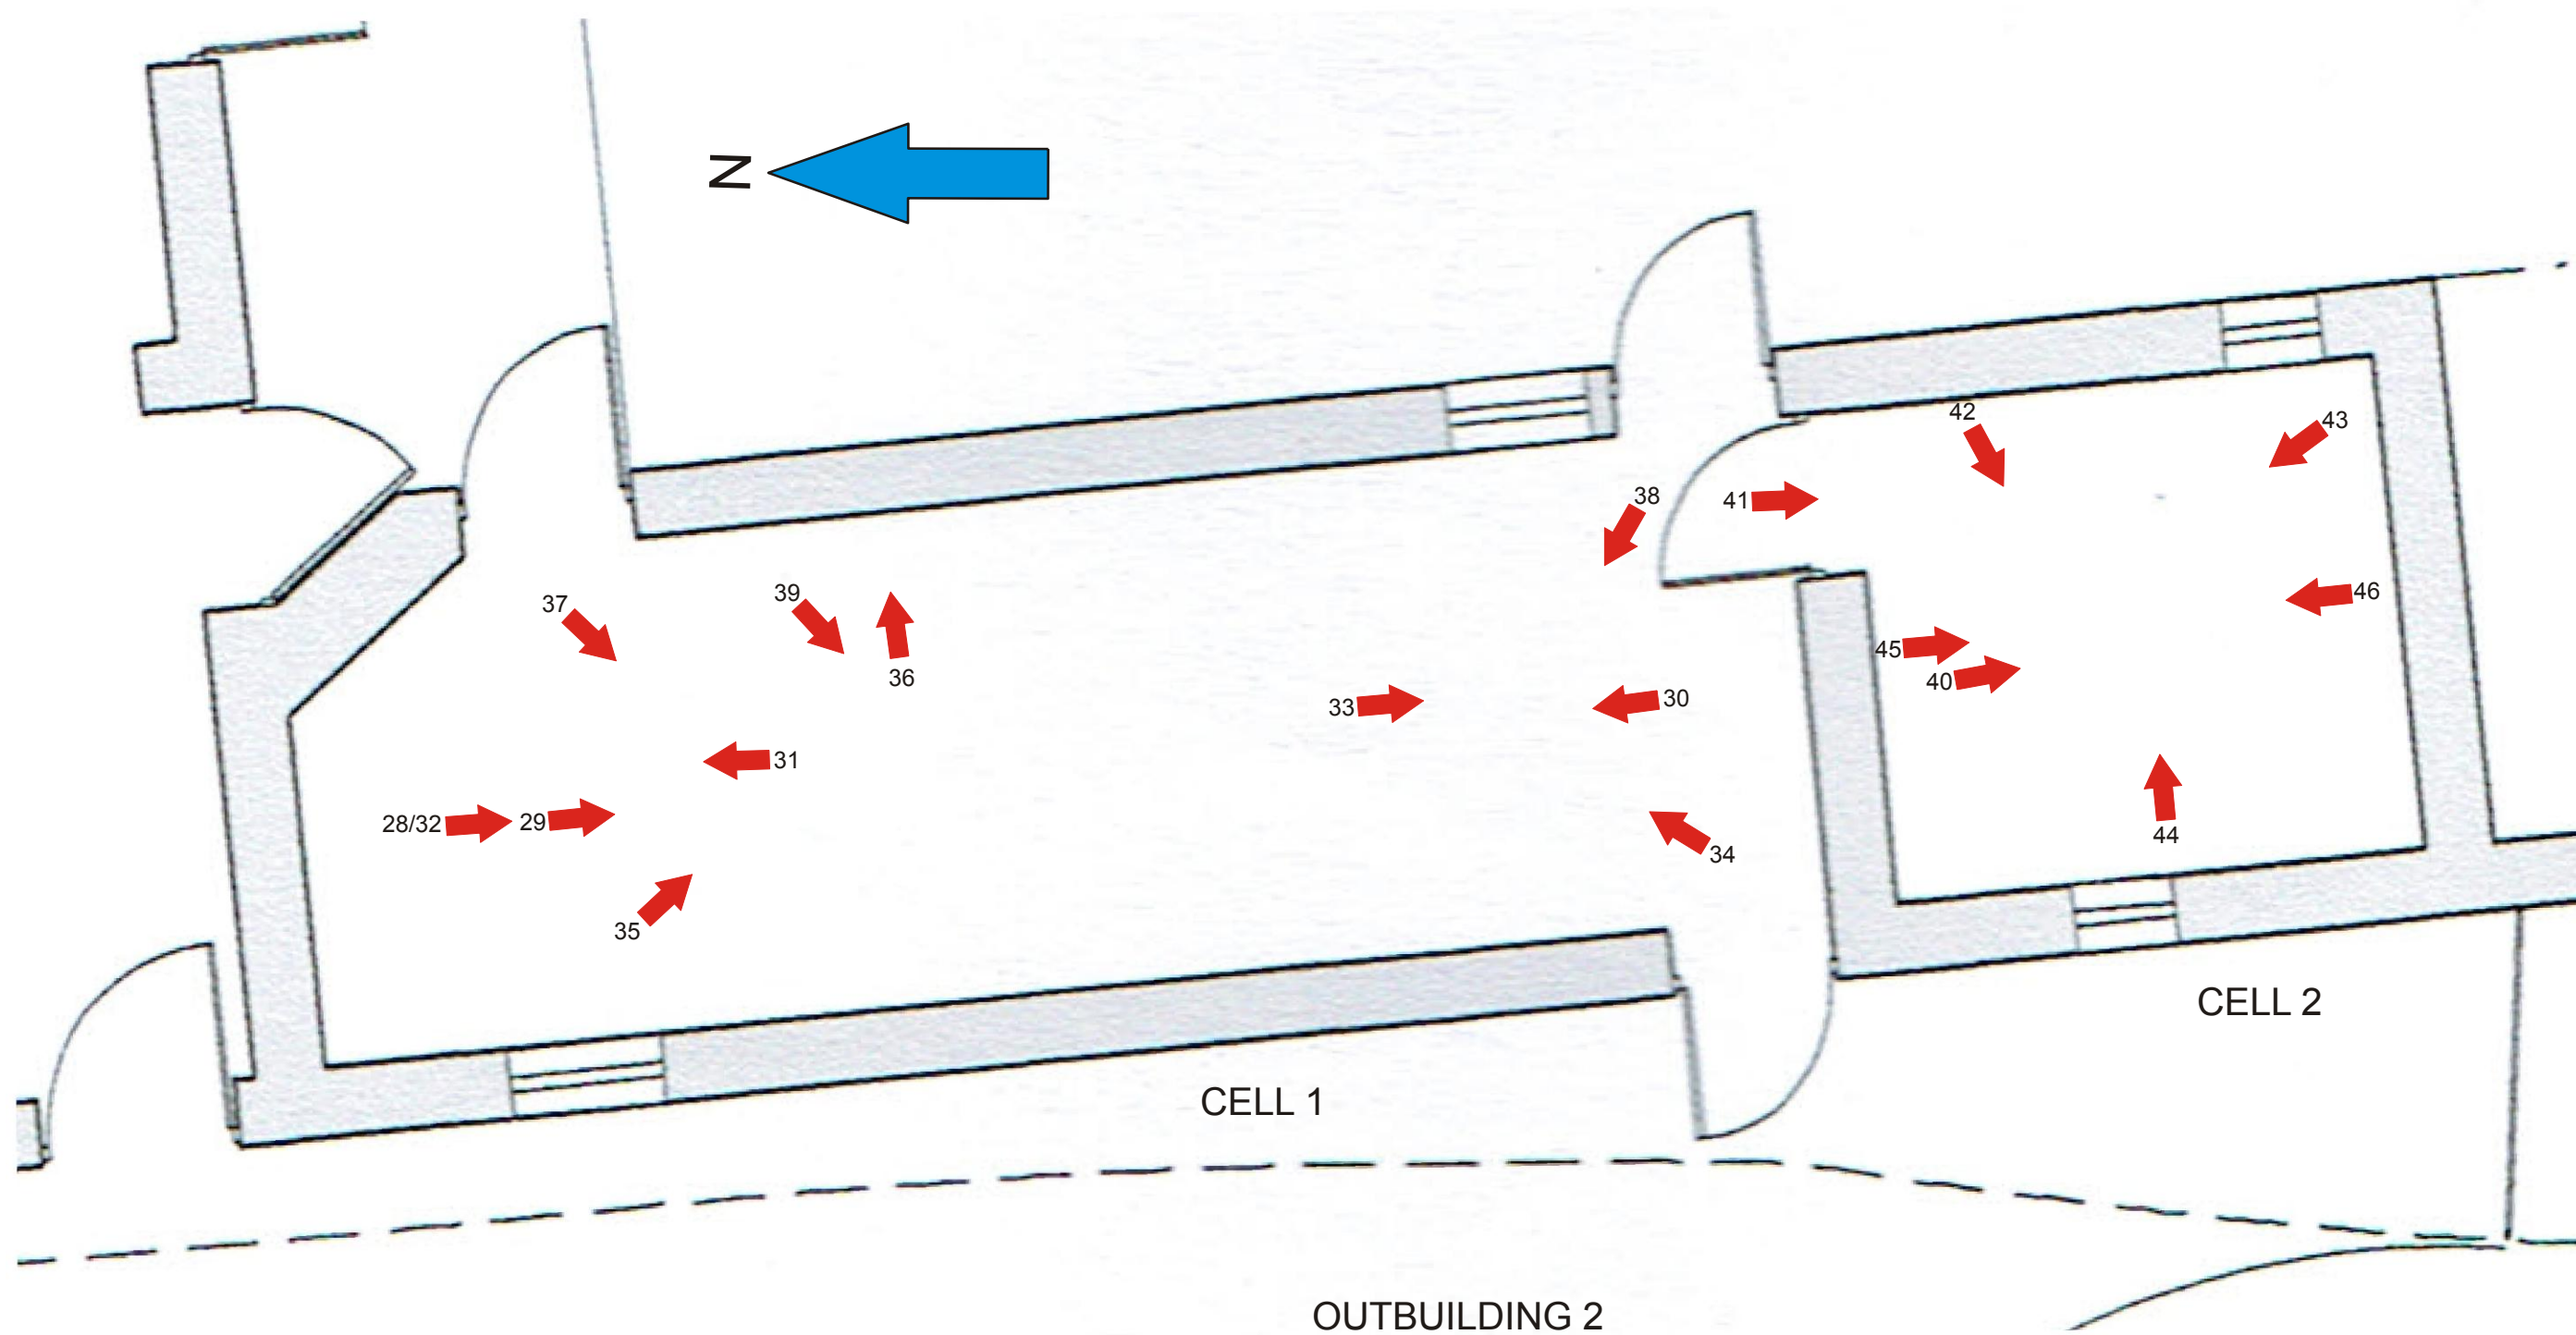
Plan showing the layout of Outbuilding 2, West Range, Unit 2, and showing the directions from which the various images (28-46) were taken from (not to scale)
